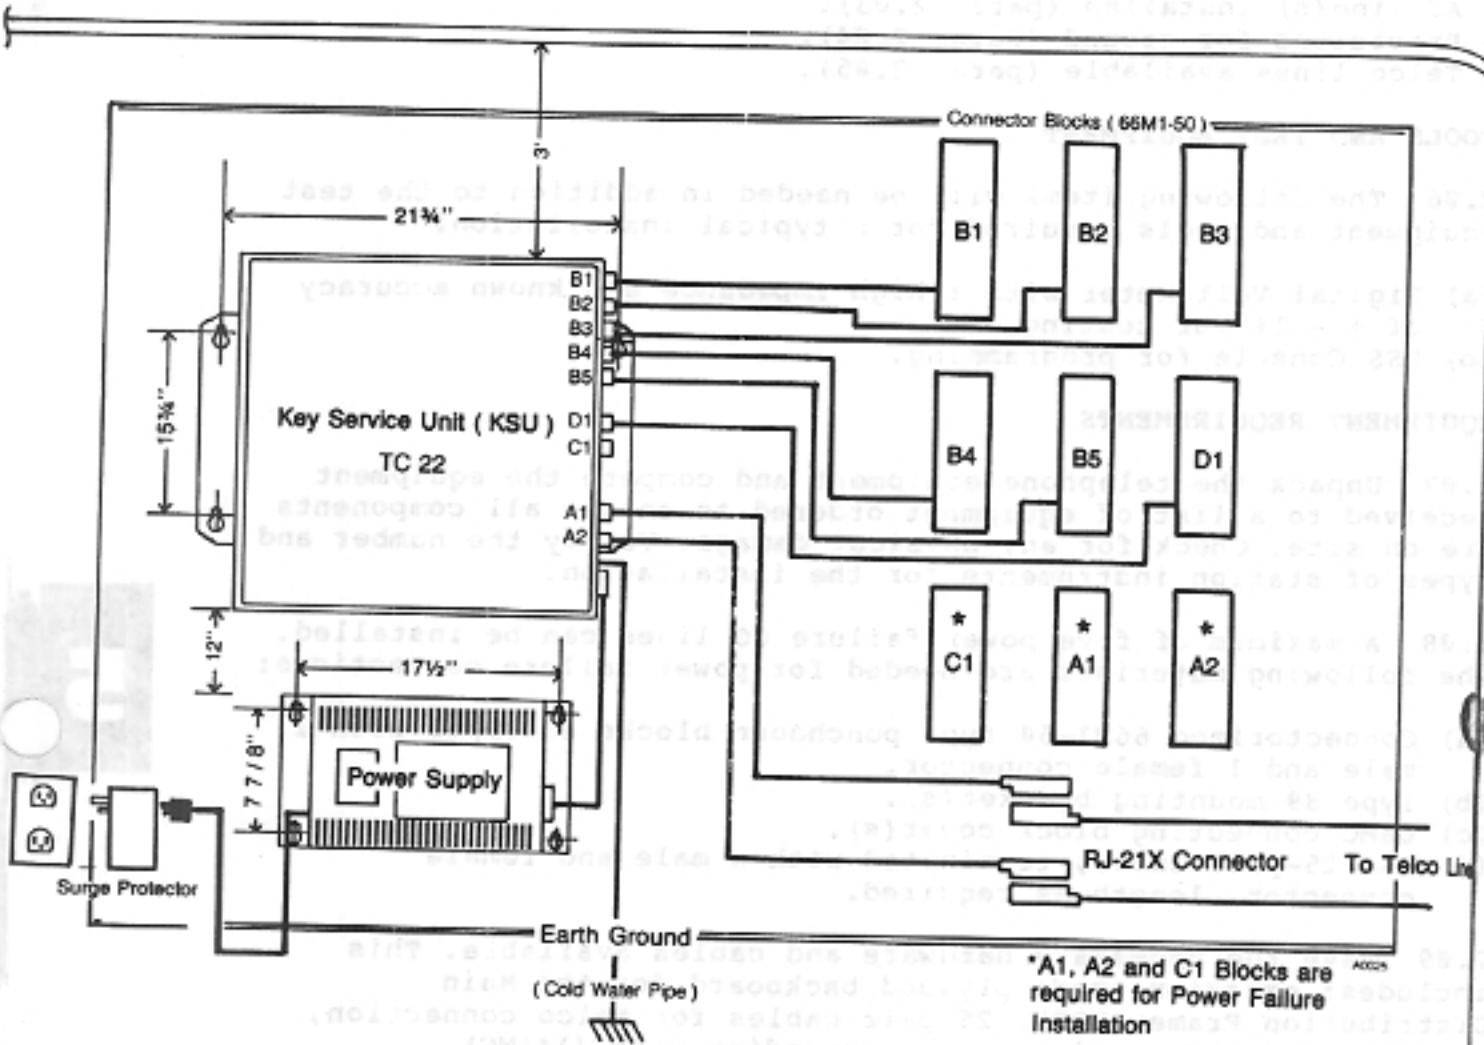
INSTALLATION LAYOUT FOR TC-22 SYSTEM
